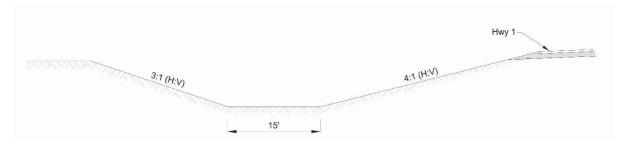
Typical Cross-Section Hwy 1 to 120th St. NE
